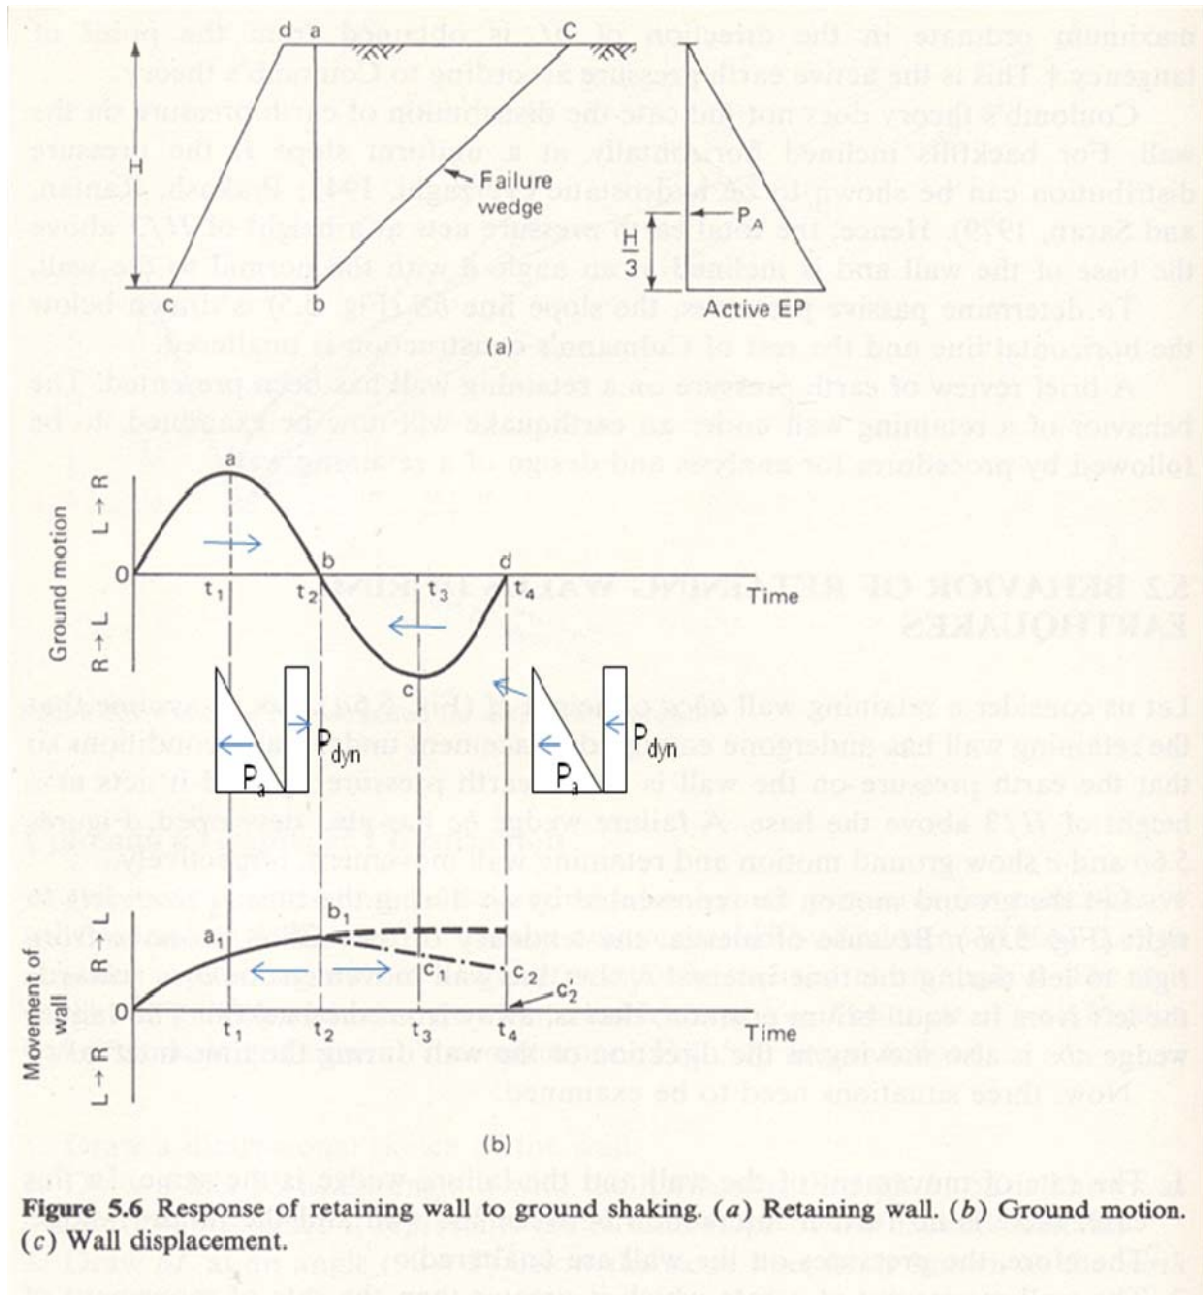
Response of retaining wall to ground shaking. (a) Retaining wall. (b) Ground motion. (c) Wall displacement.
